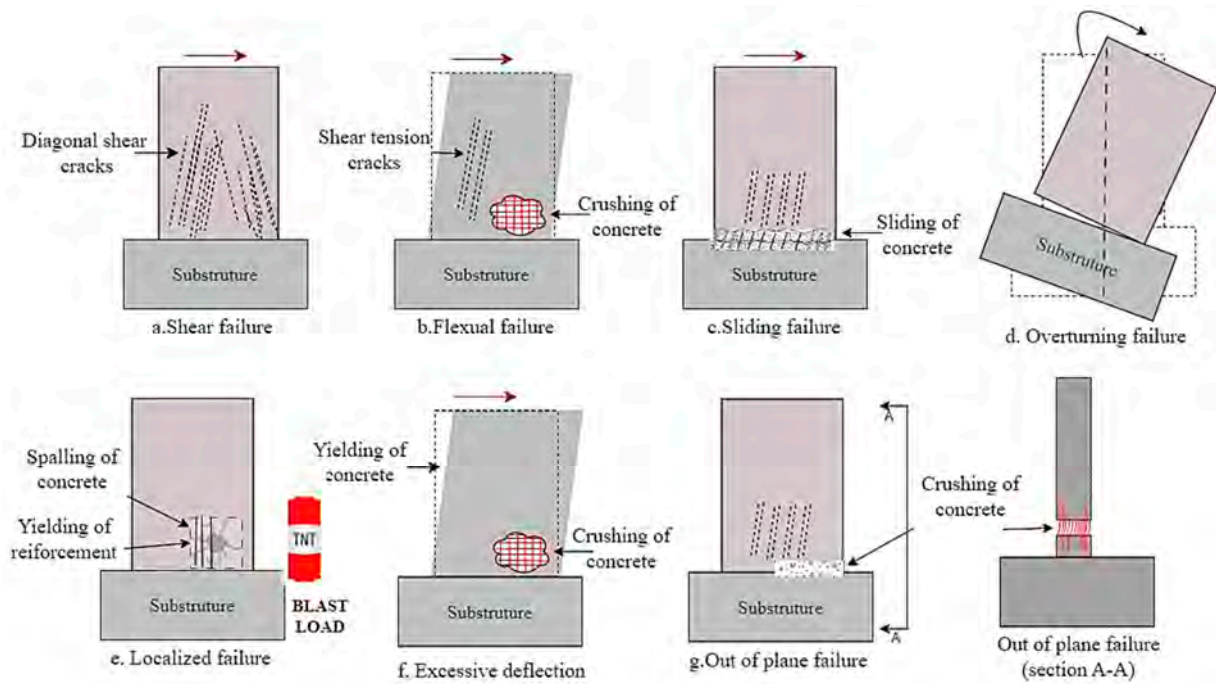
Typical types of shear failures in shear walls subjected to dynamic loadings.
